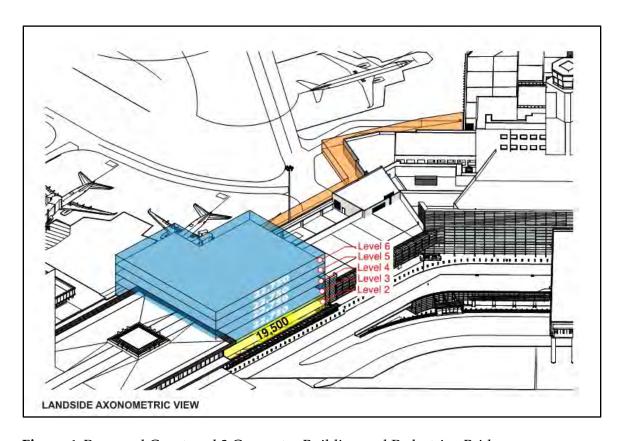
Proposed Courtyard 3 Connector Building and Pedestrian Bridge
